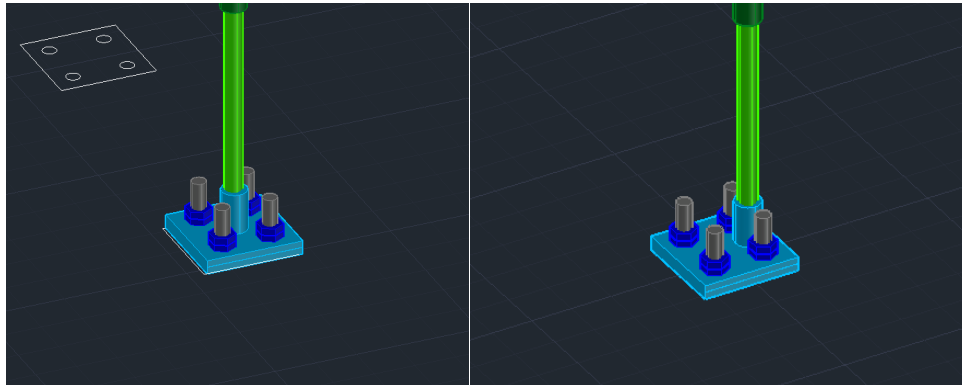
Steel plates and hardware for Strong Floor connections.
